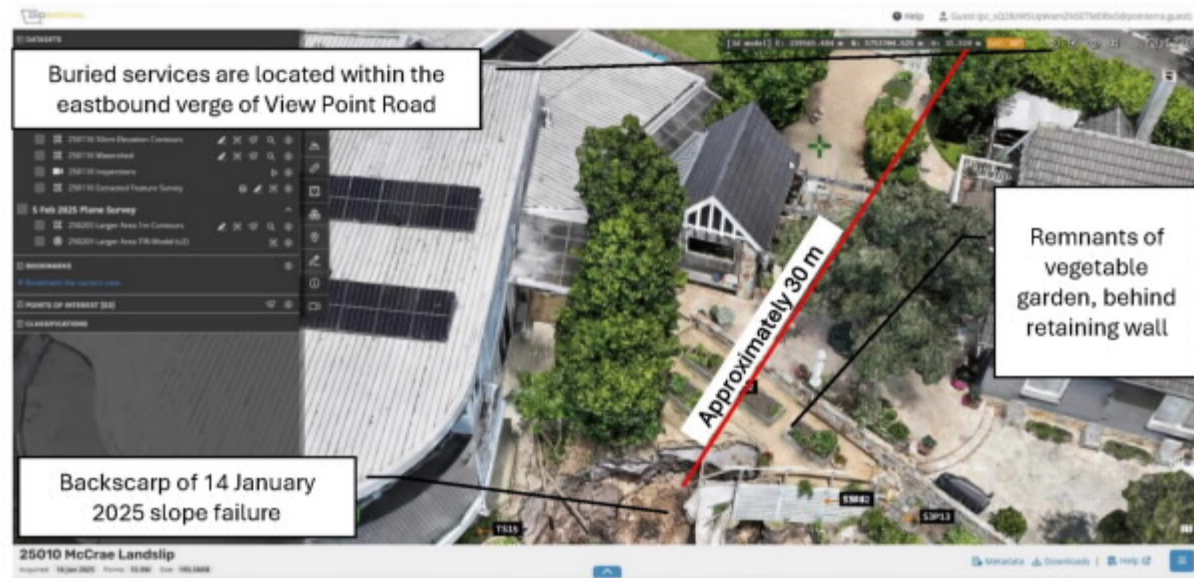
Drone footage showing the infrastructure, buildings vegetation and distance between View Point Road and the failure
